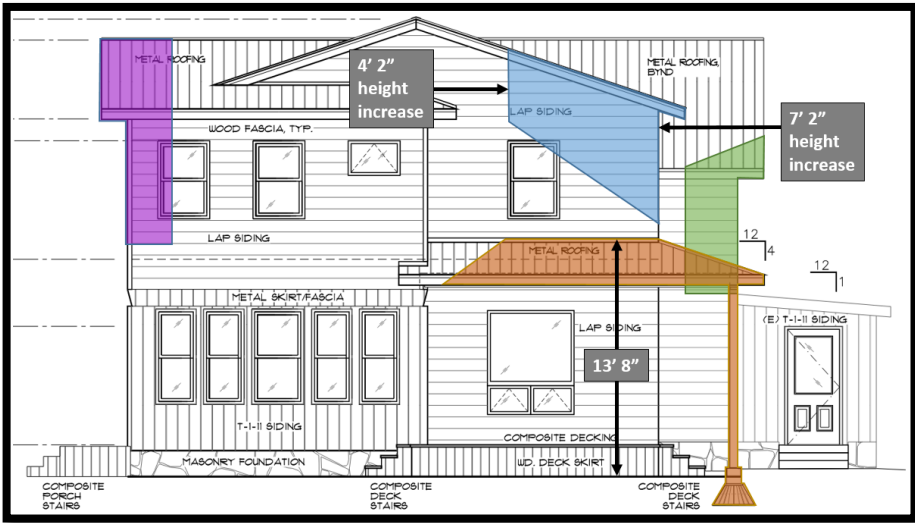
Figure B - View of Side Elevation from Fifth Street – Proposed Encroachments
